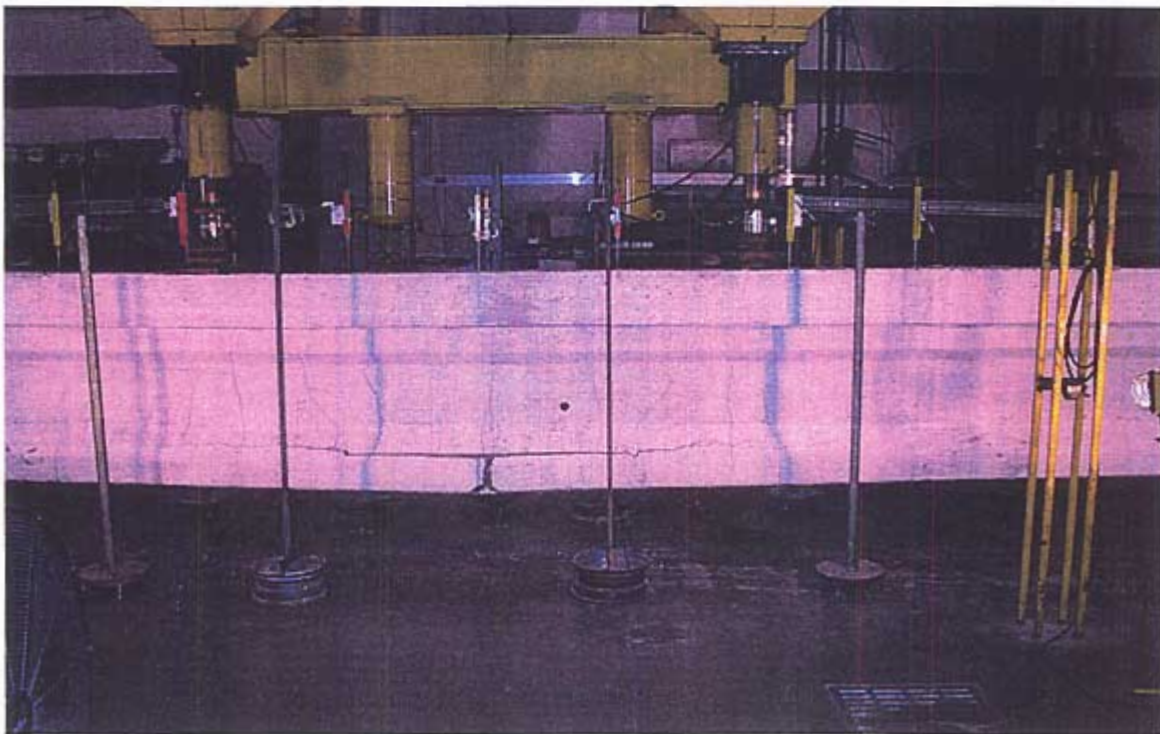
Test Specimen 6 at Failure Showing Significant Cracking in Patched Area
